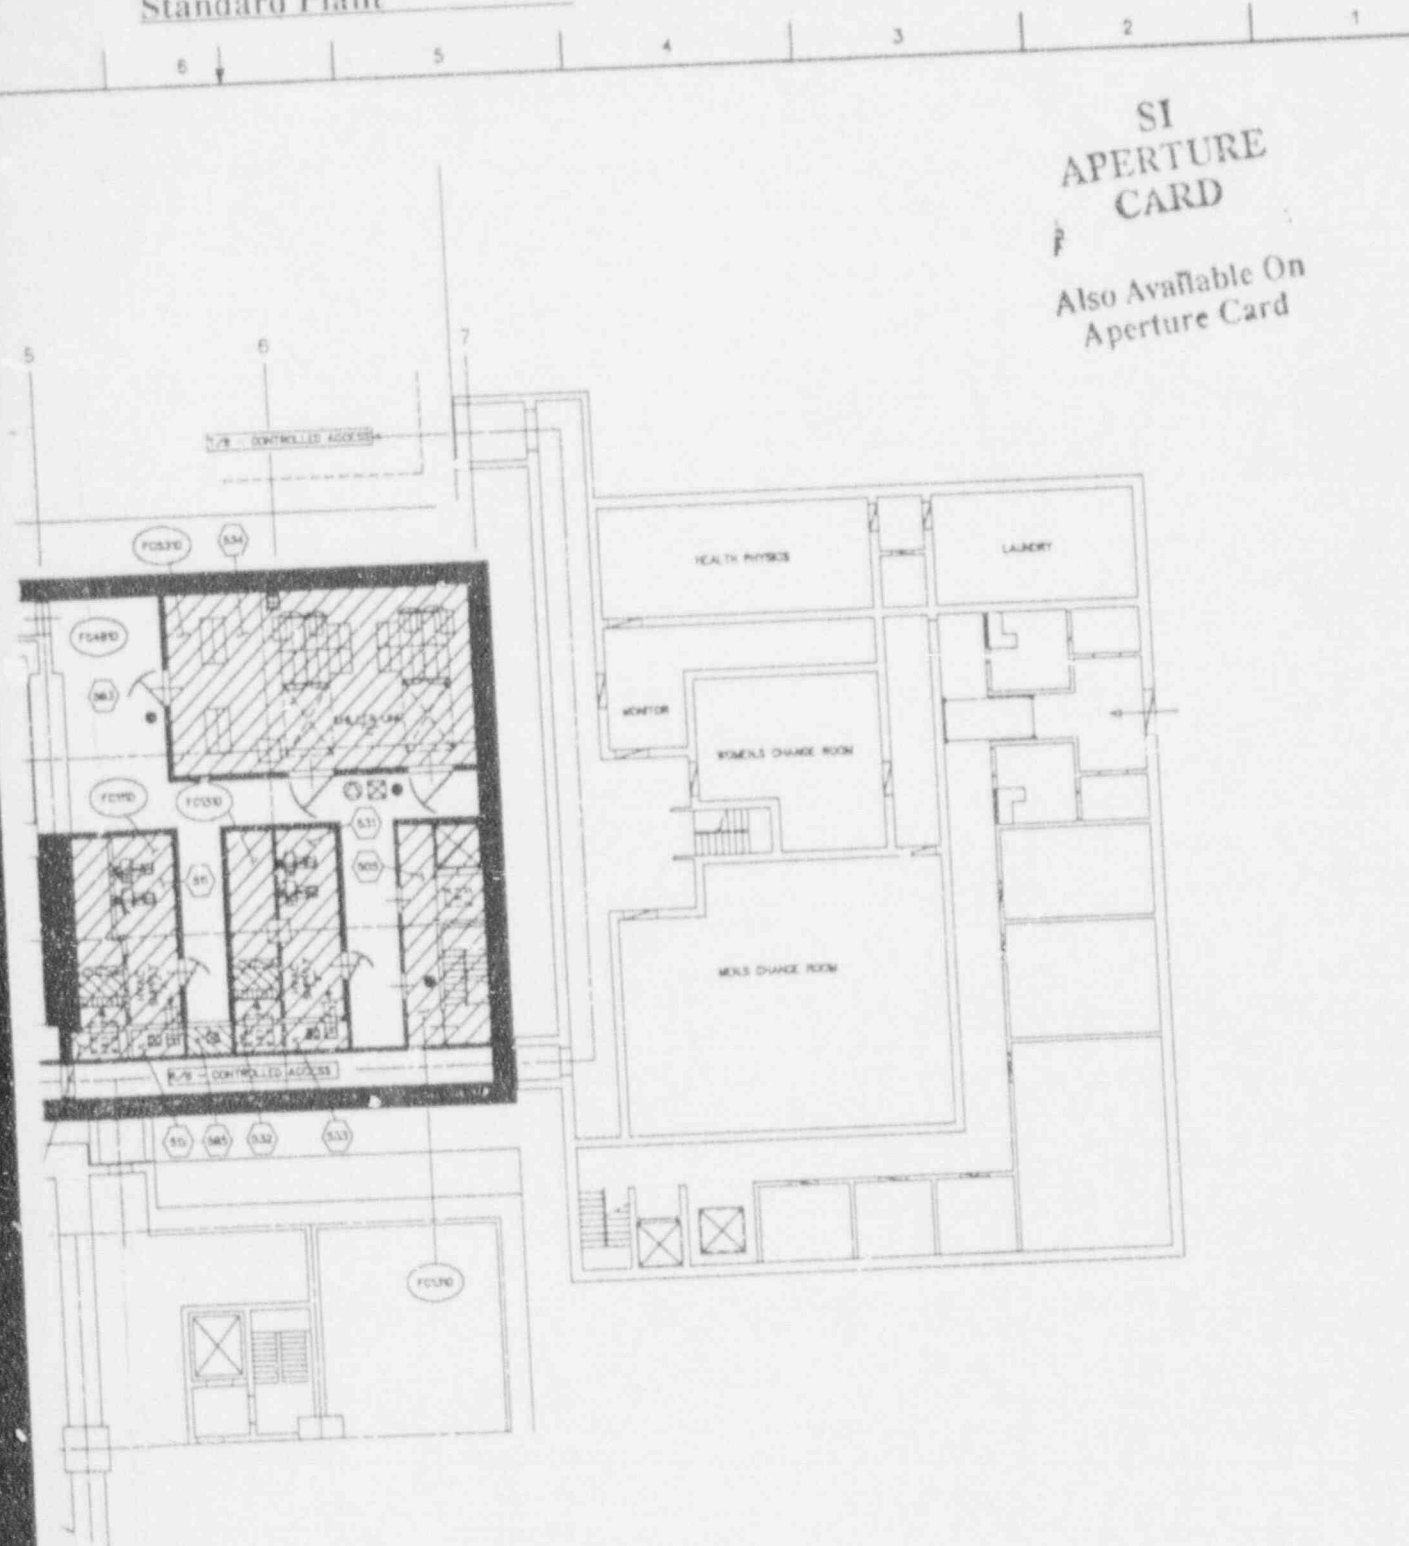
A.4-15 CONTROL BUILDING FIRE PROTECTION AT ELEVATION 7'00mm
